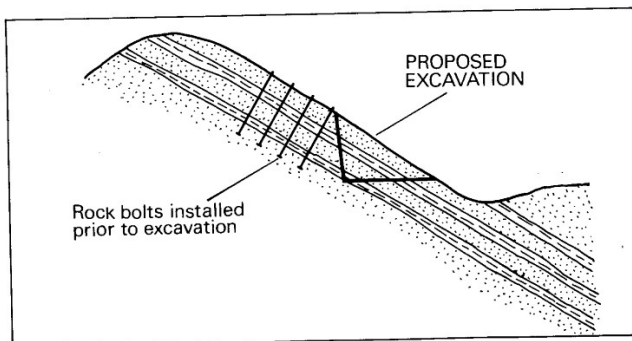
Stabilisation of slope by pattern rock bolting prior to excavation
